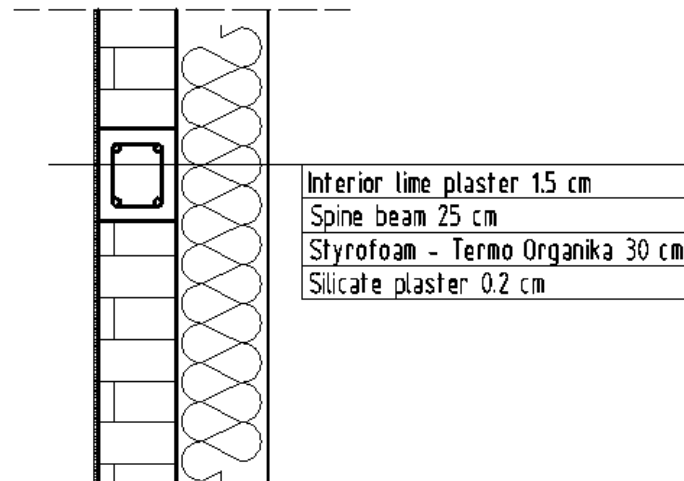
Structure of the exterior wall with the concrete beam covered with plaster.
